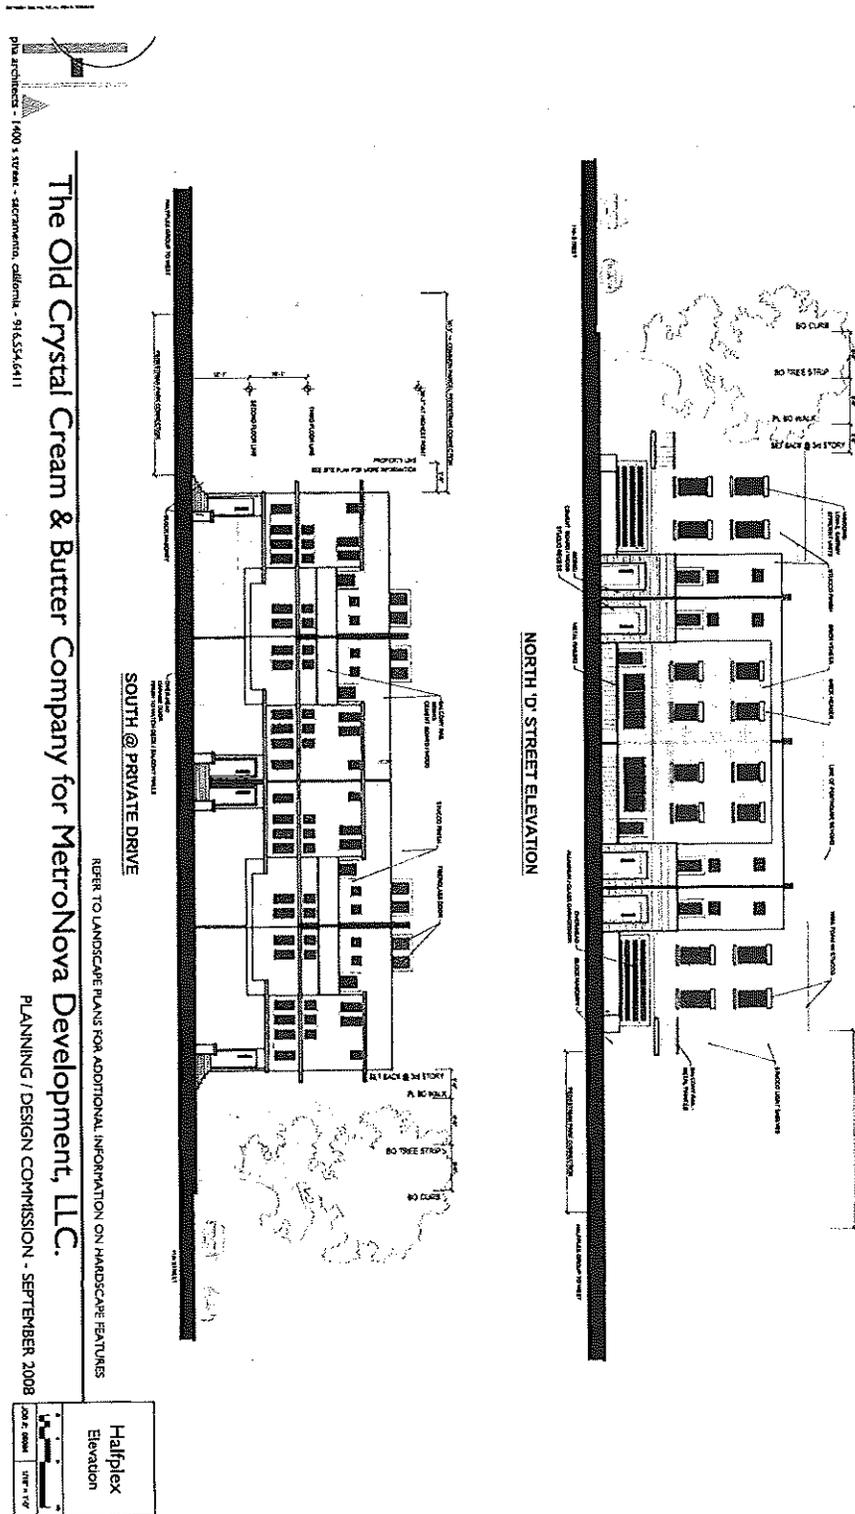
Exhibit RR: South Block: Halfplex (Lot 10) Elevations (North and South)
